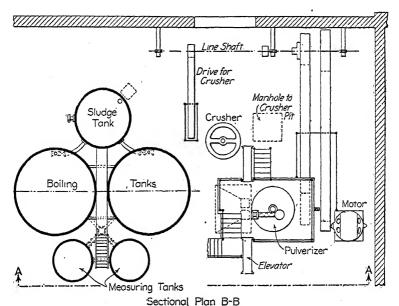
An alum manufacturing plant at the Columbus, O., filter plant.
